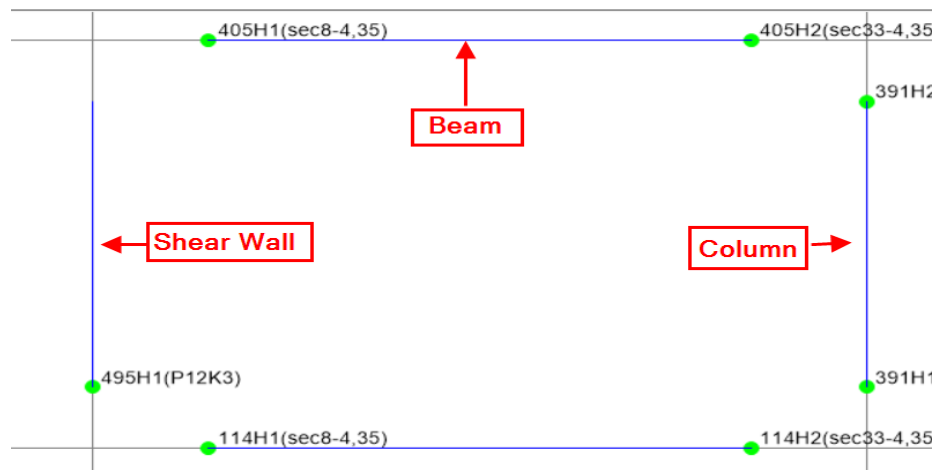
Assignments of plastic hinge for beam, column, and shear wall
